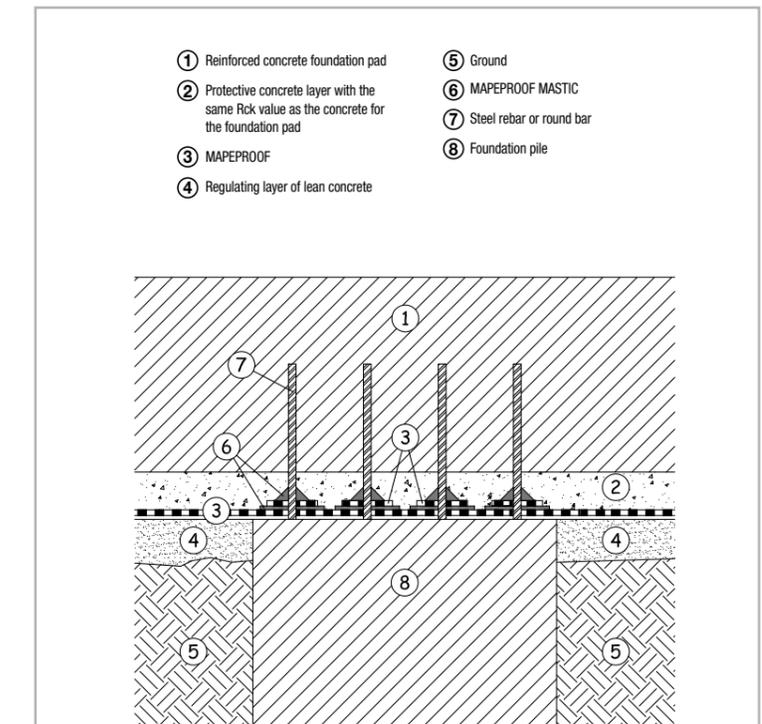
Detailed layout of waterproofing the heads of piles which work together with the foundation pad without passing through the bentonite sheet
